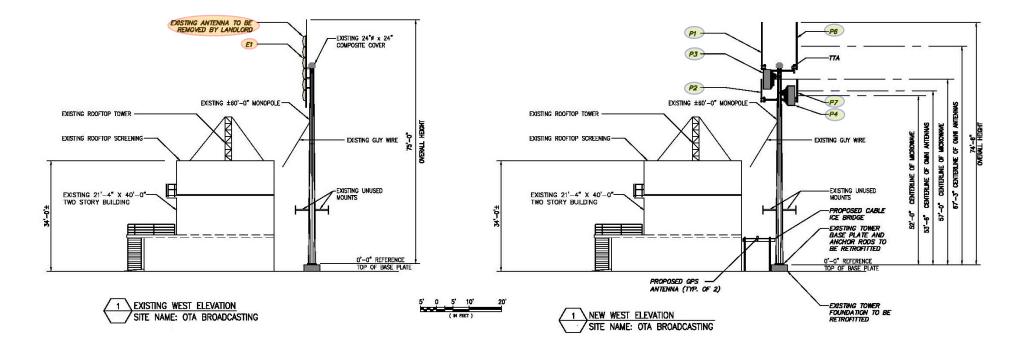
Site 25 - Mt. Burdell OTA Existing and Proposed Elevations
